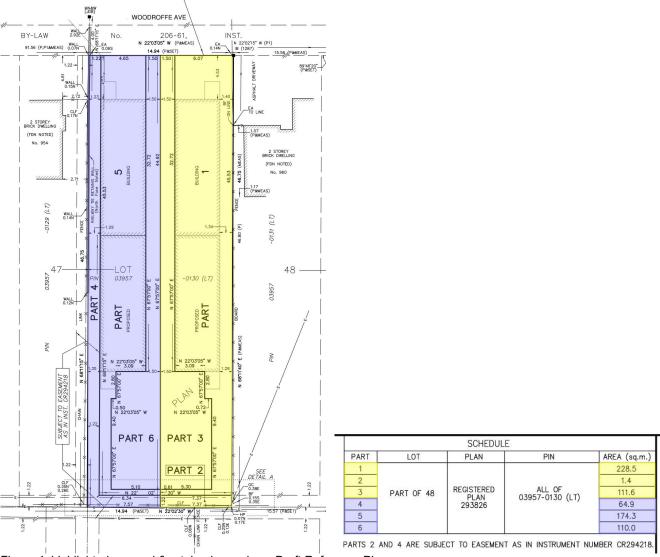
highlighted severed & retained parcels on Draft Reference Plan
